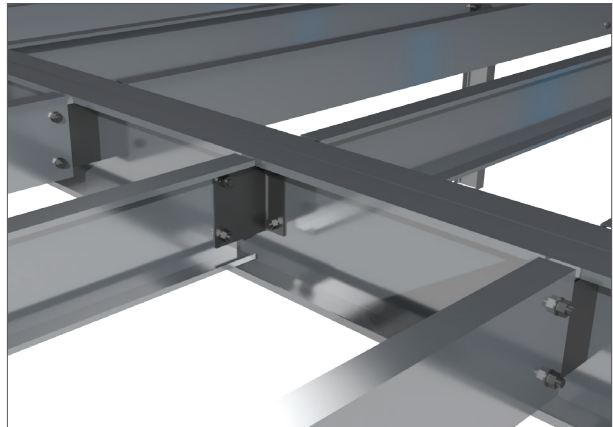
Detail of floor beam inset connection to a girder of thin-walled C section
